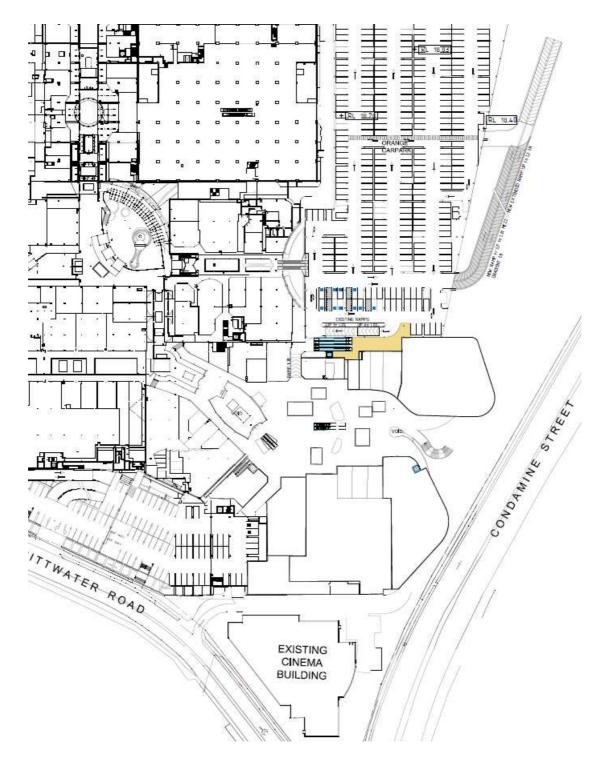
Part Retail Level 1M floor plan showing the proposed carparking areas
